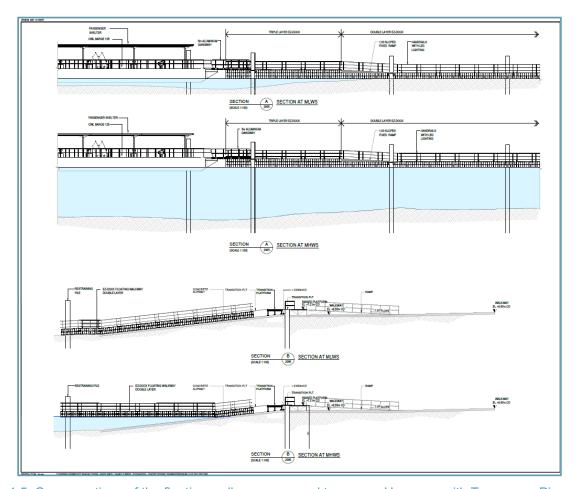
Cross-sections of the floating walkway proposed to access Hammersmith Temporary Pier Source: Beckett Rankine, Drawing 2048-BRL-01-XX-DR-C-2007_T01
